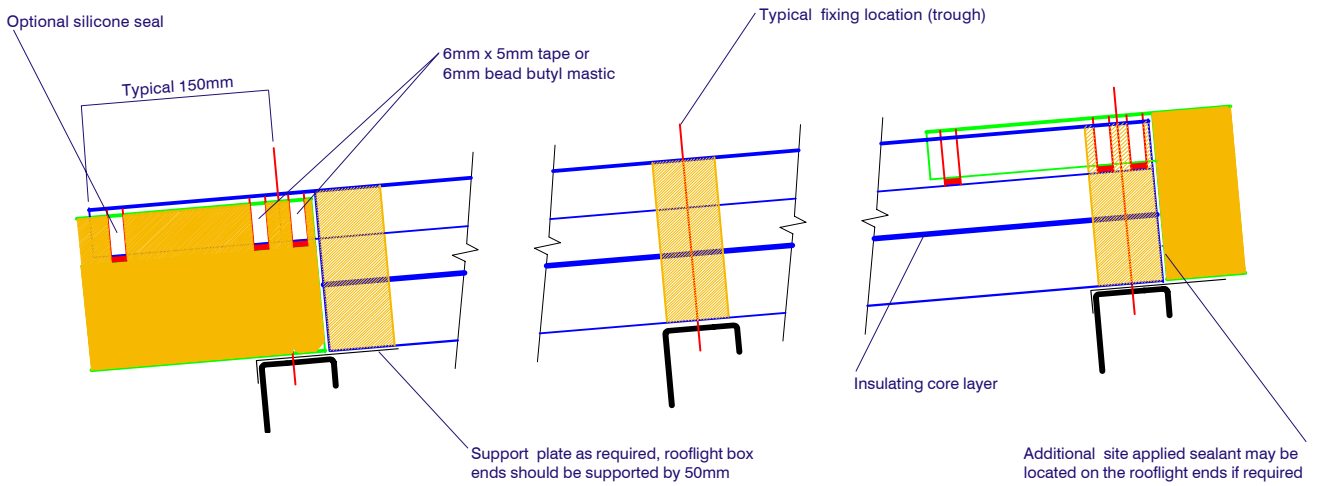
FILON Monarch Barrel Light - Cross Section (typical)
